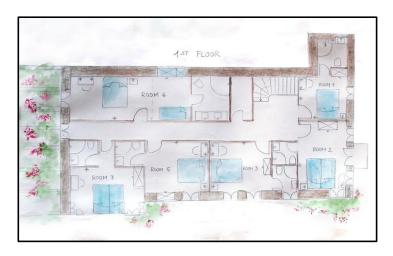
1. Floor (http://tasotel.com/otel-plani)
